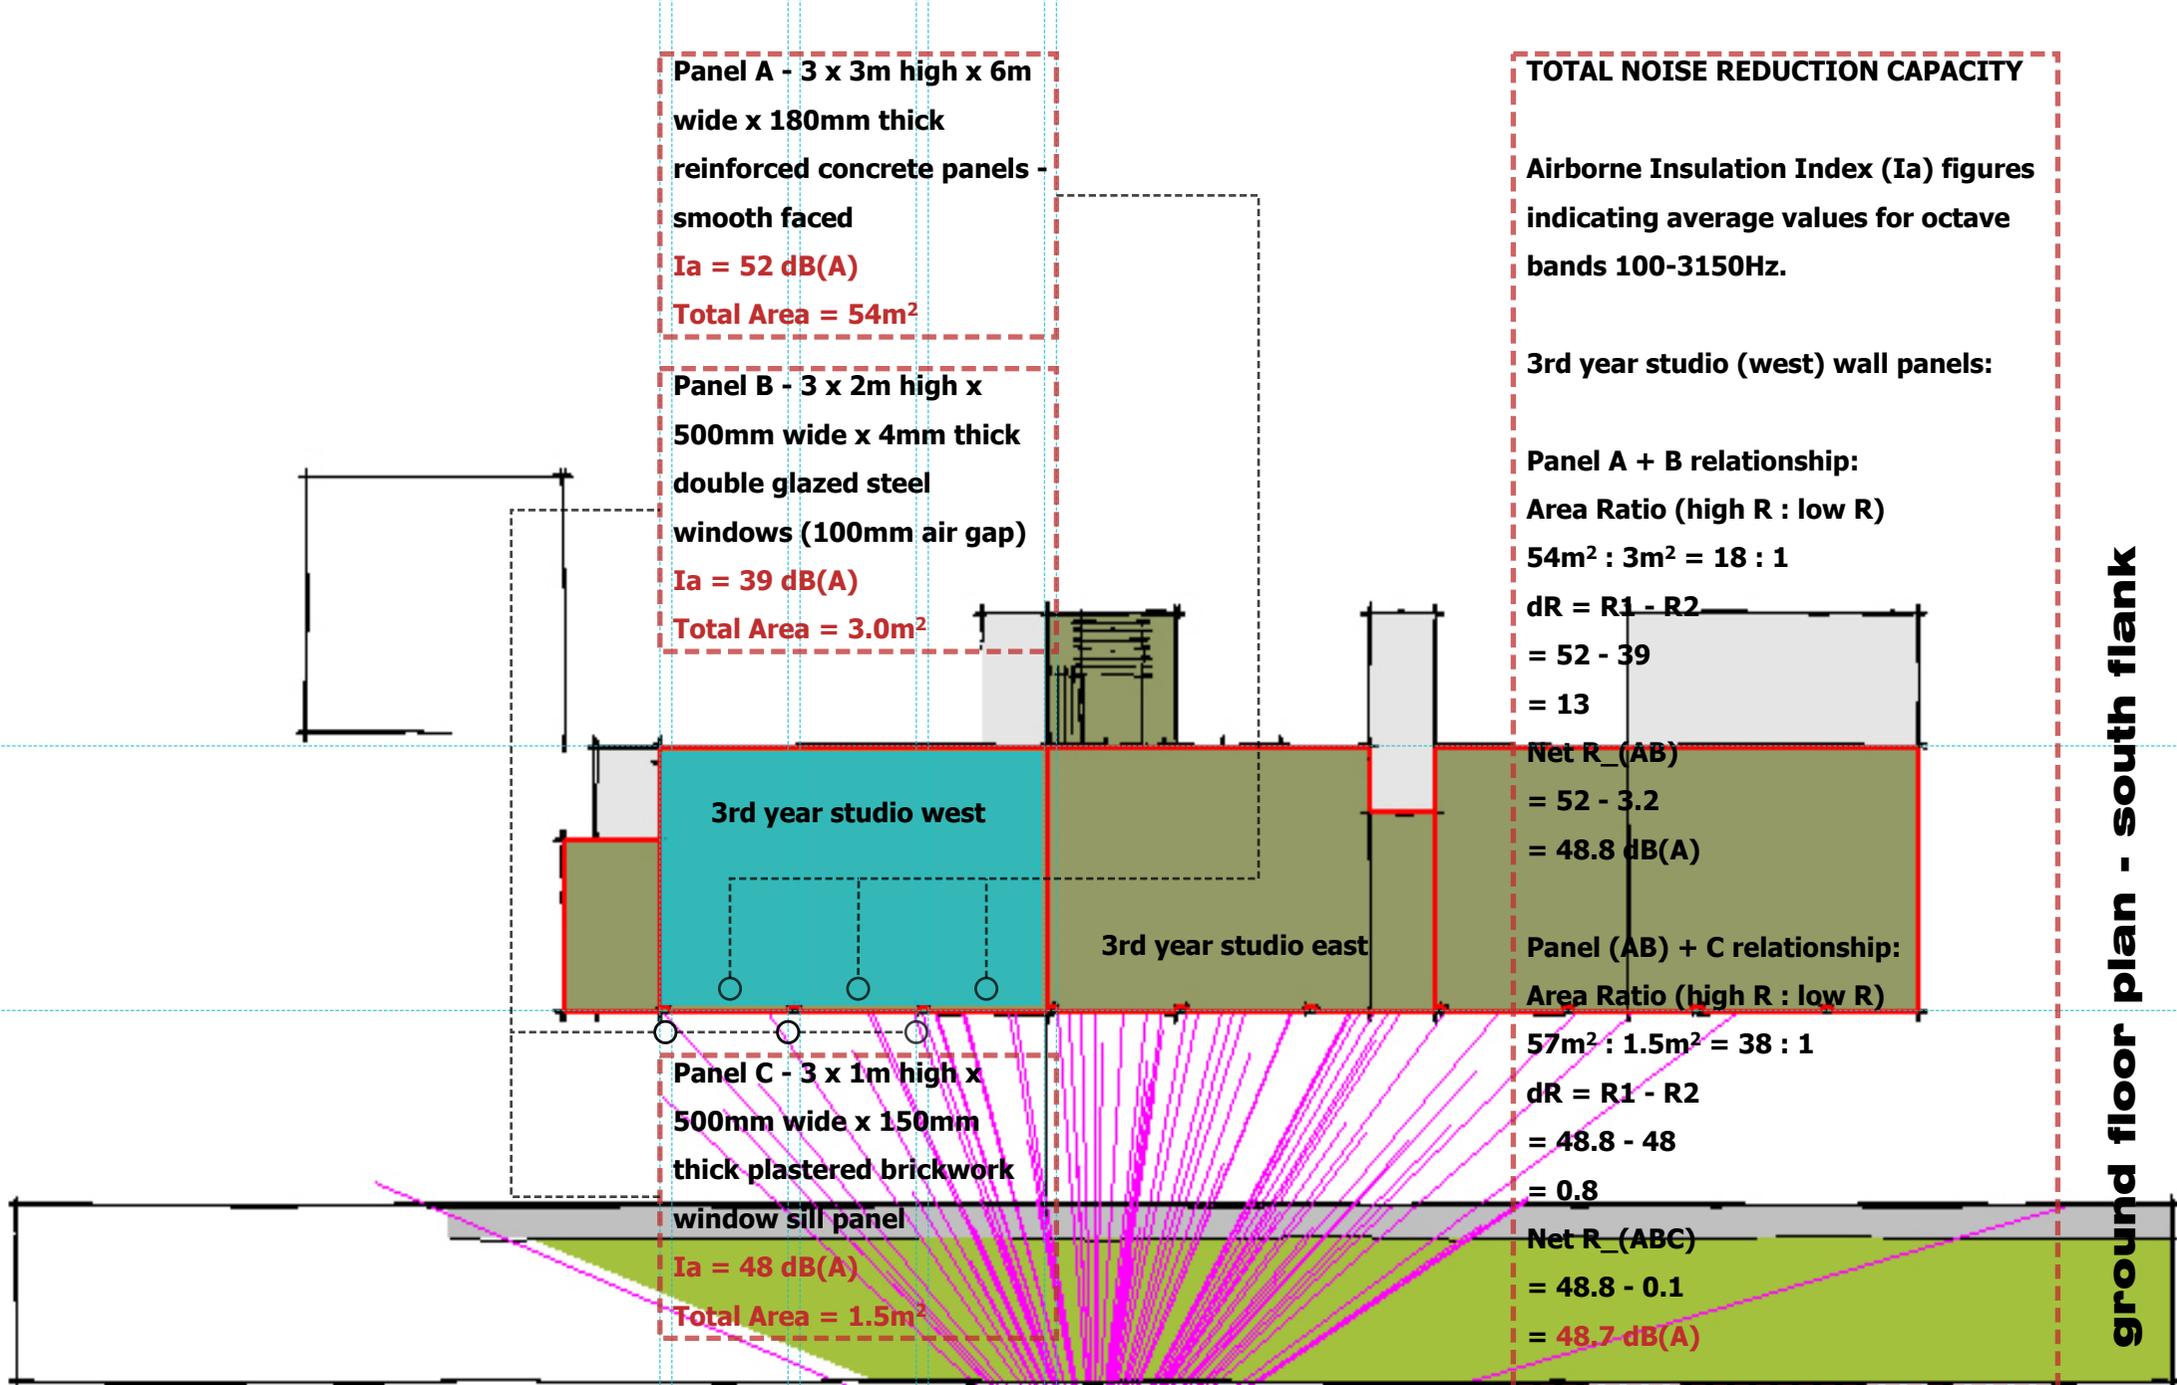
Boukunde II - Ground Floor sketchplan (south flank)
